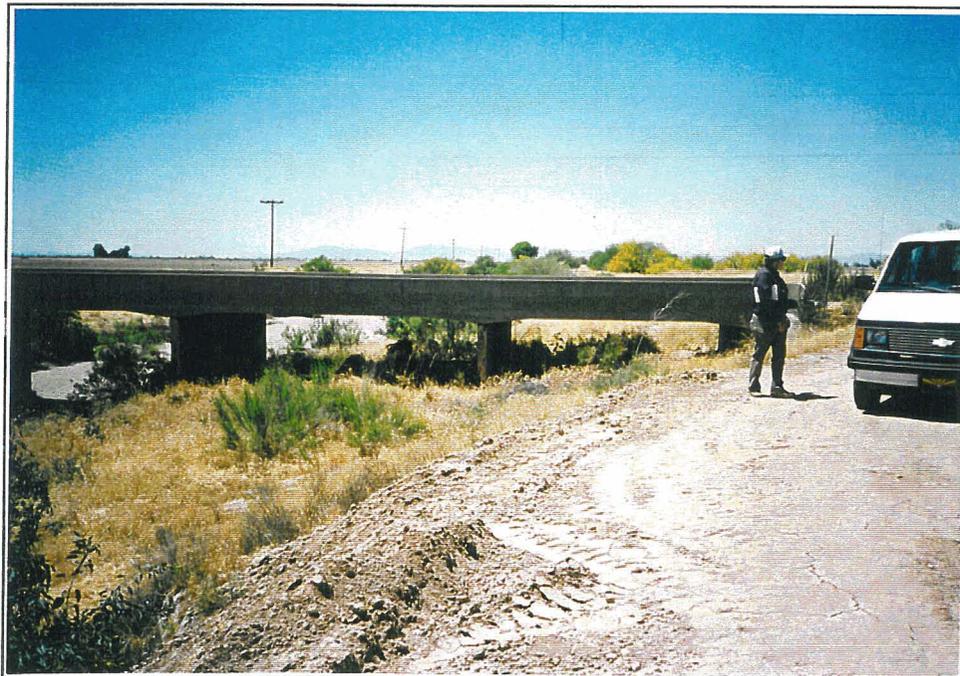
View of upstream face showing spans 1 and 2. Note significantly reduced cross-section.
